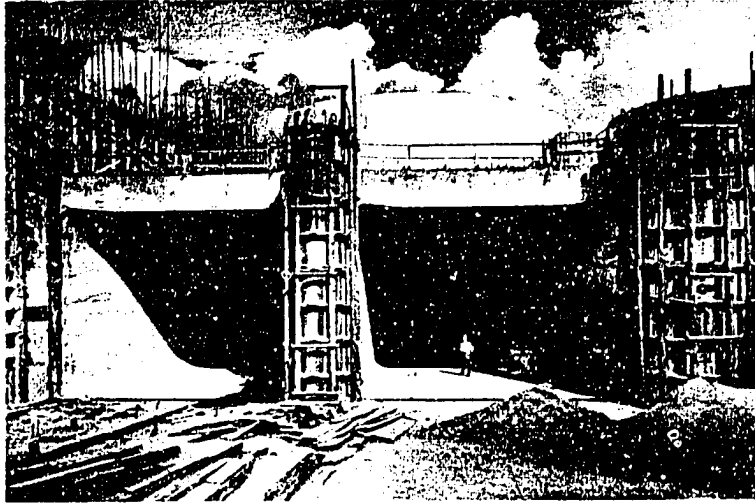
Hydro plant of the Tiszalök project. Outlet of reinforced concrete draft tube of one of the Kaplan turbines
